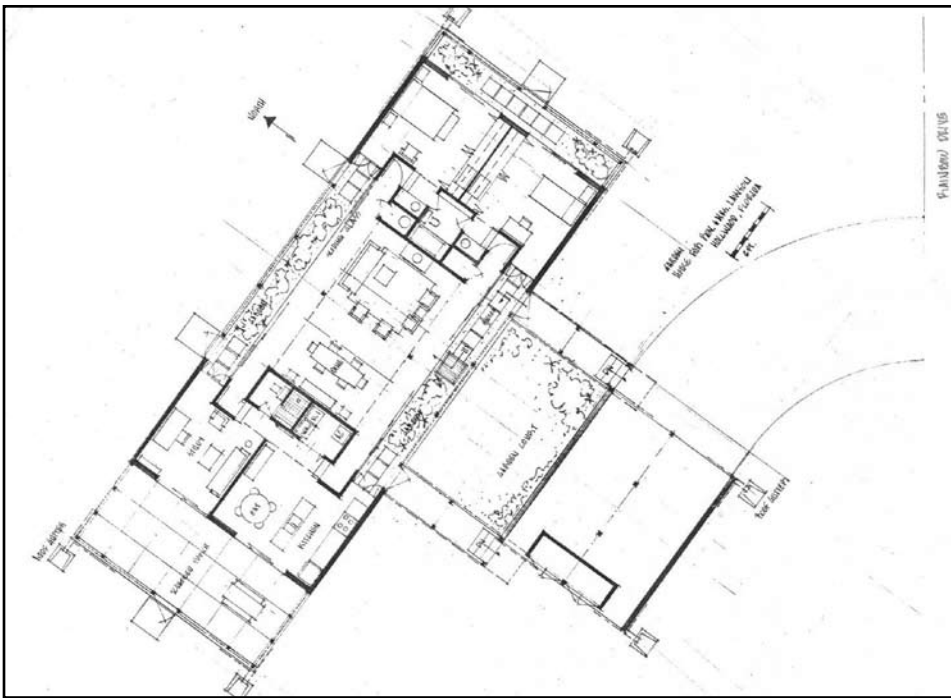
Floor plan of the LAWSON HOUSE (c. 1960). [Charles Reed, Jr. collection]
